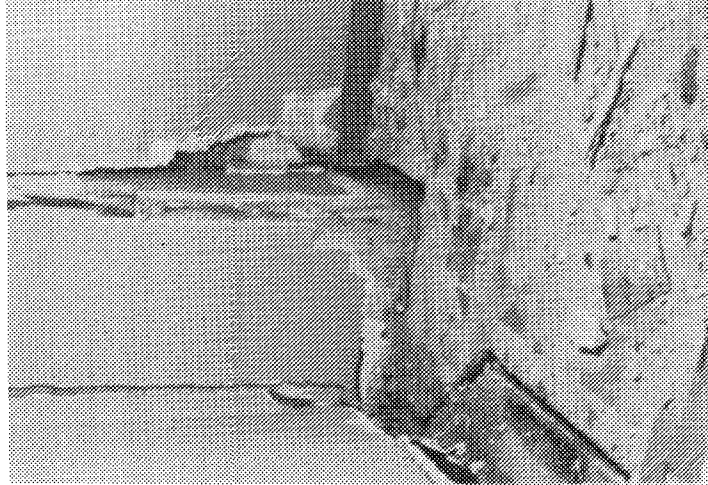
DAMAGE AT SEISMIC JOINTS DUE TO HAMMERING OF BUILDING AGAINST WAREHOUSE
